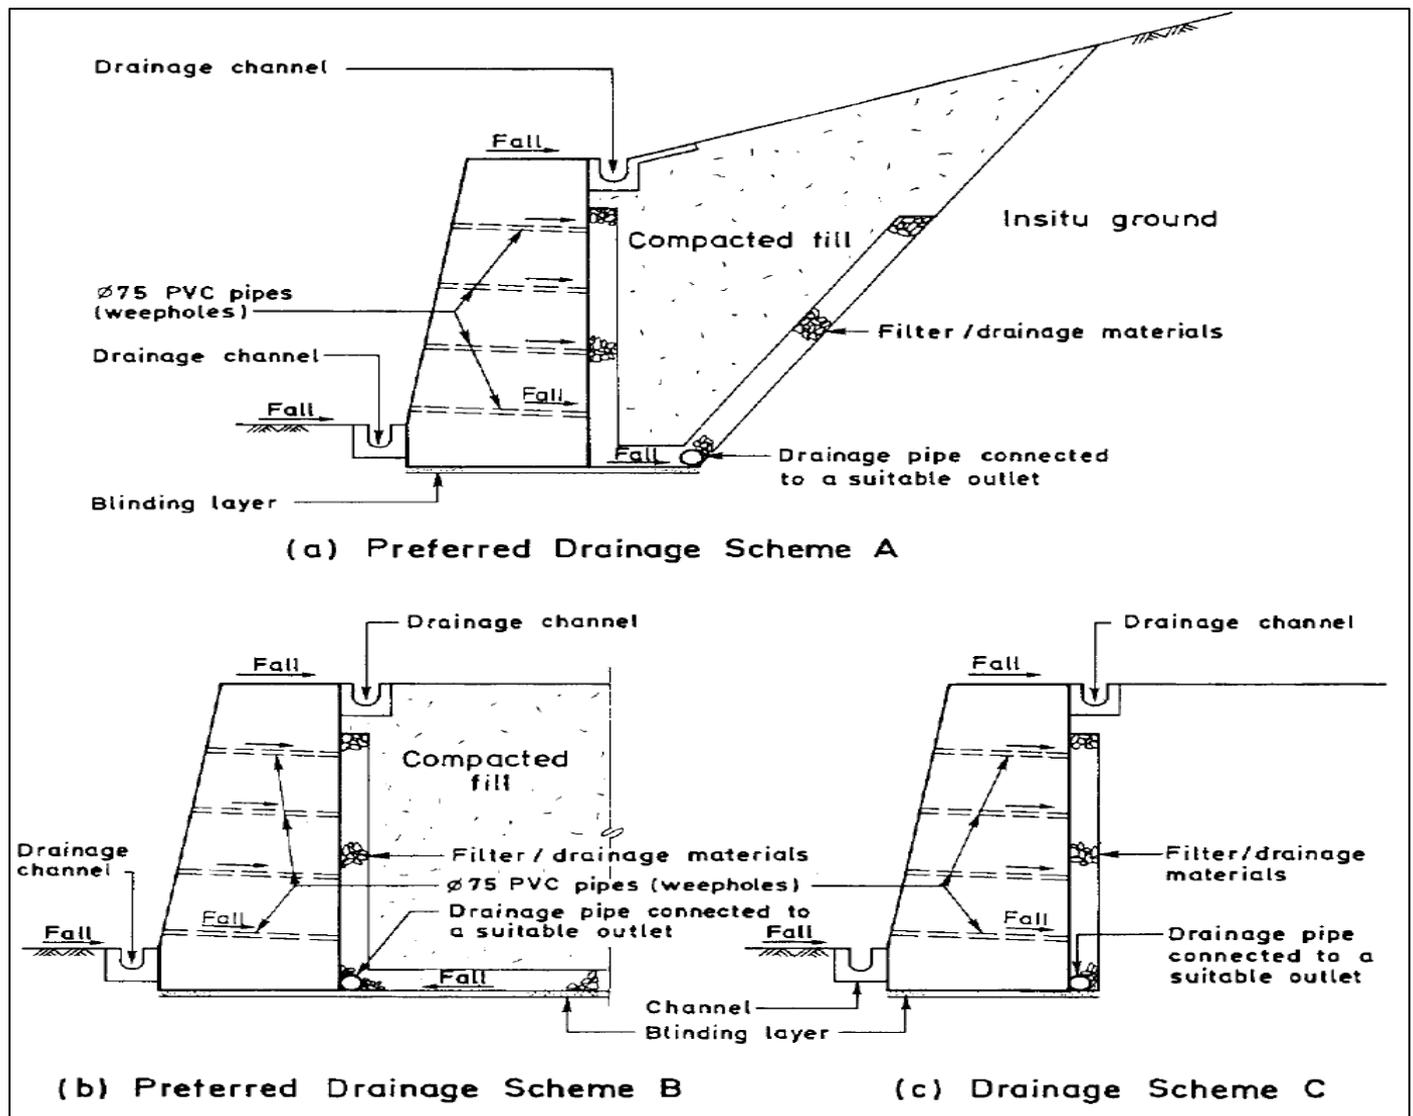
Drainage Schemes for Gravity Retaining Walls (geotechnical Engineering Office, (1993)
